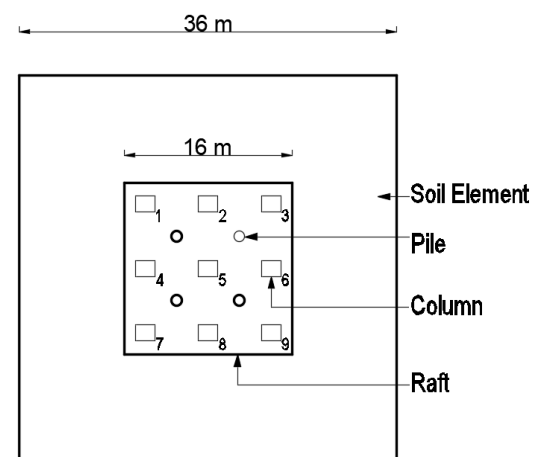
Position of Piles in Piled Raft Foundation-Type B- Pile at half of bay (4 nos. of piles)
